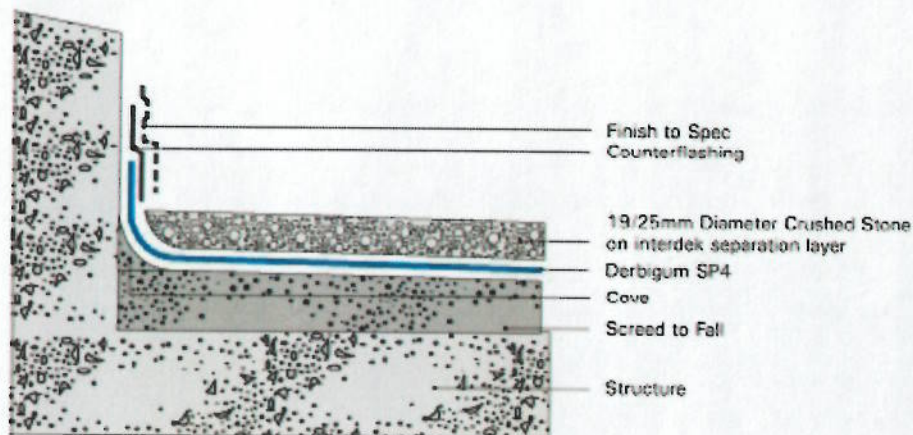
Cross-section of waterproofing detail with 19/25mm stone
